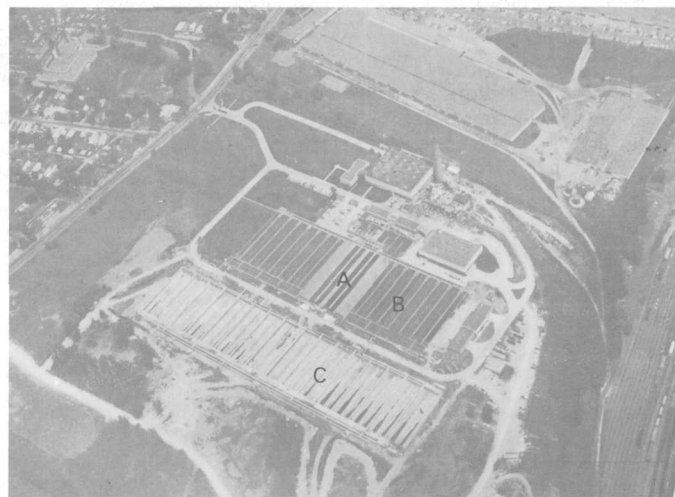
Low-altitude oblique photograph (1980) of sewage treatment plant undergoing additional construction, St. Louis, Mo.
